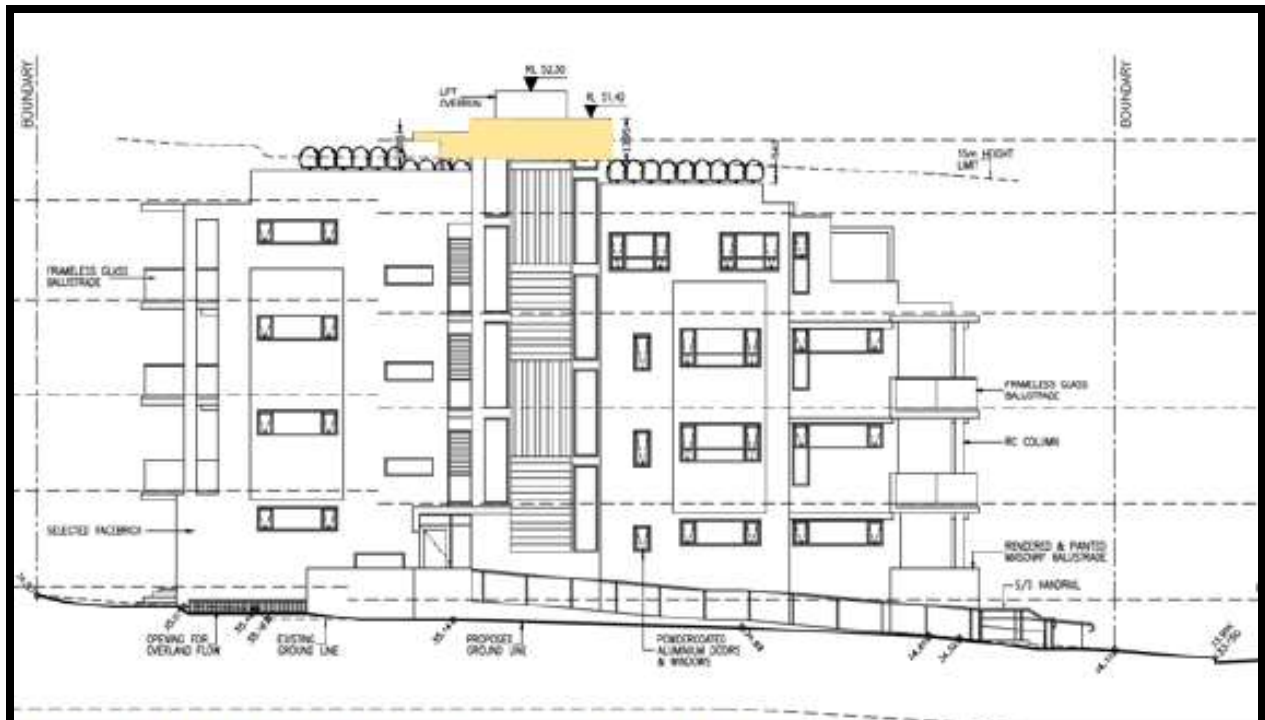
Extent of building height non-compliance along the north-western building elevation
